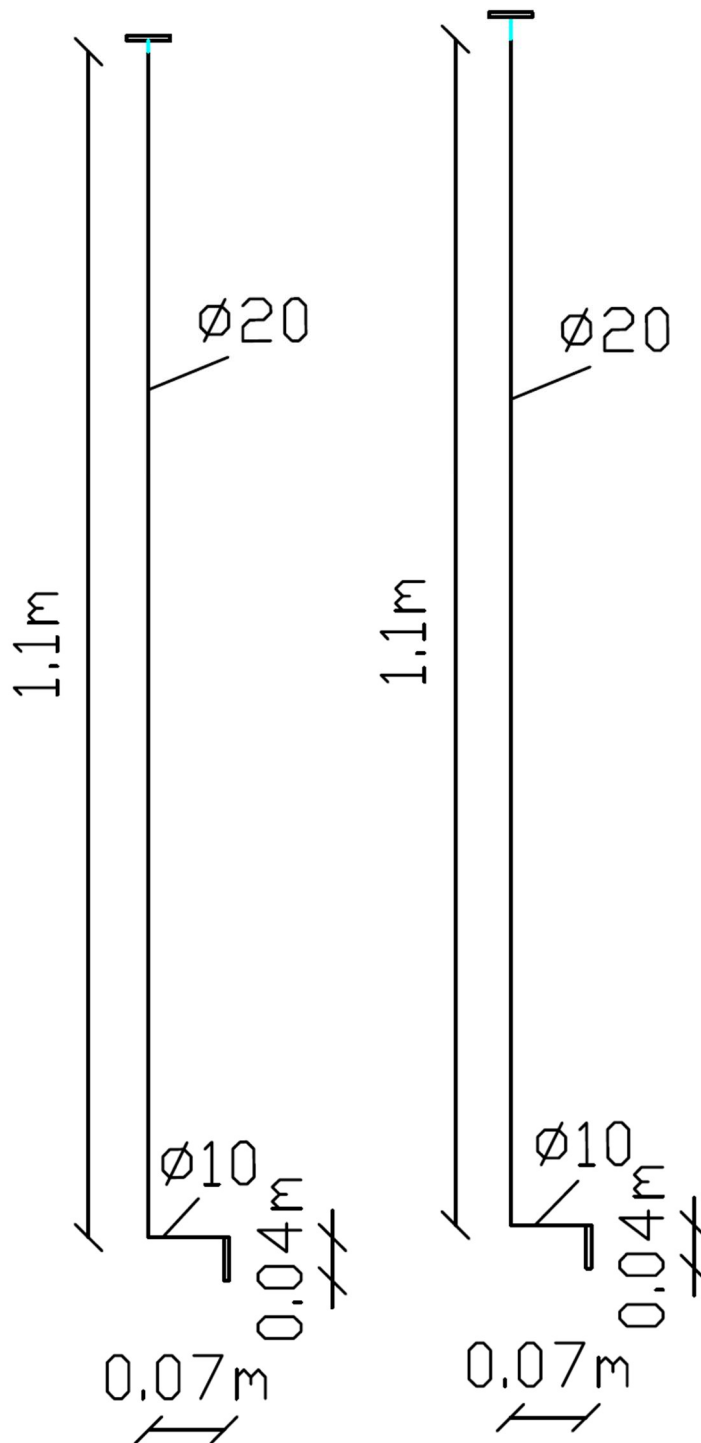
Cross section of living wall 2-1 left, 2-1 right
